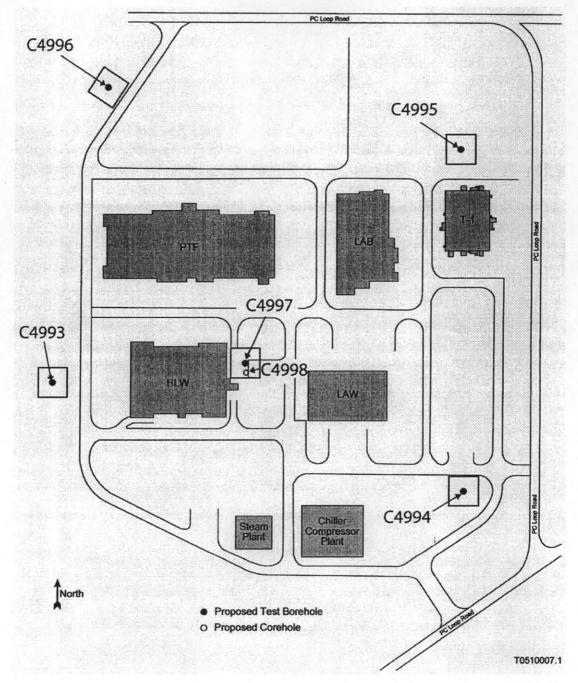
Planned Drilling Locations at the Waste Treatment Plant, Hanford, Washington.
